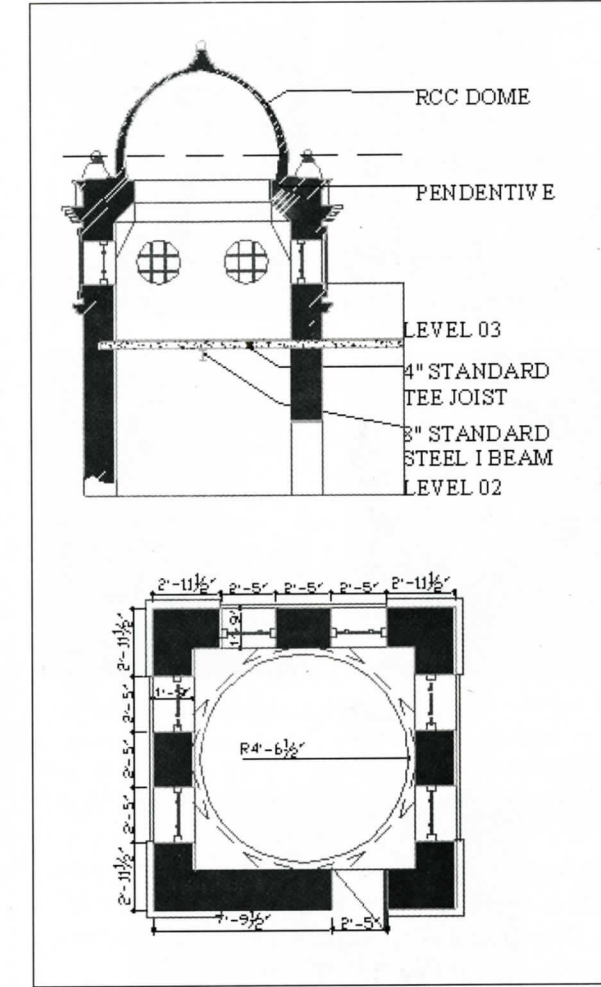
Showing a typical detail of dome in the Chittagong Court Building
